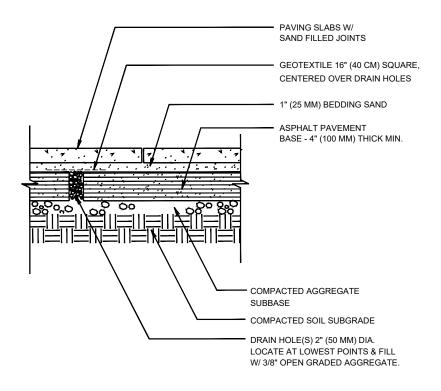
A typical cross section with an asphalt base and sand-set paving slabs
